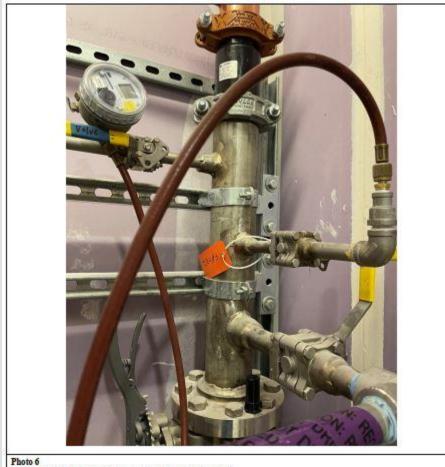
TLRW #3 recycled water PRV located on floor 3 (floors 1-7)
